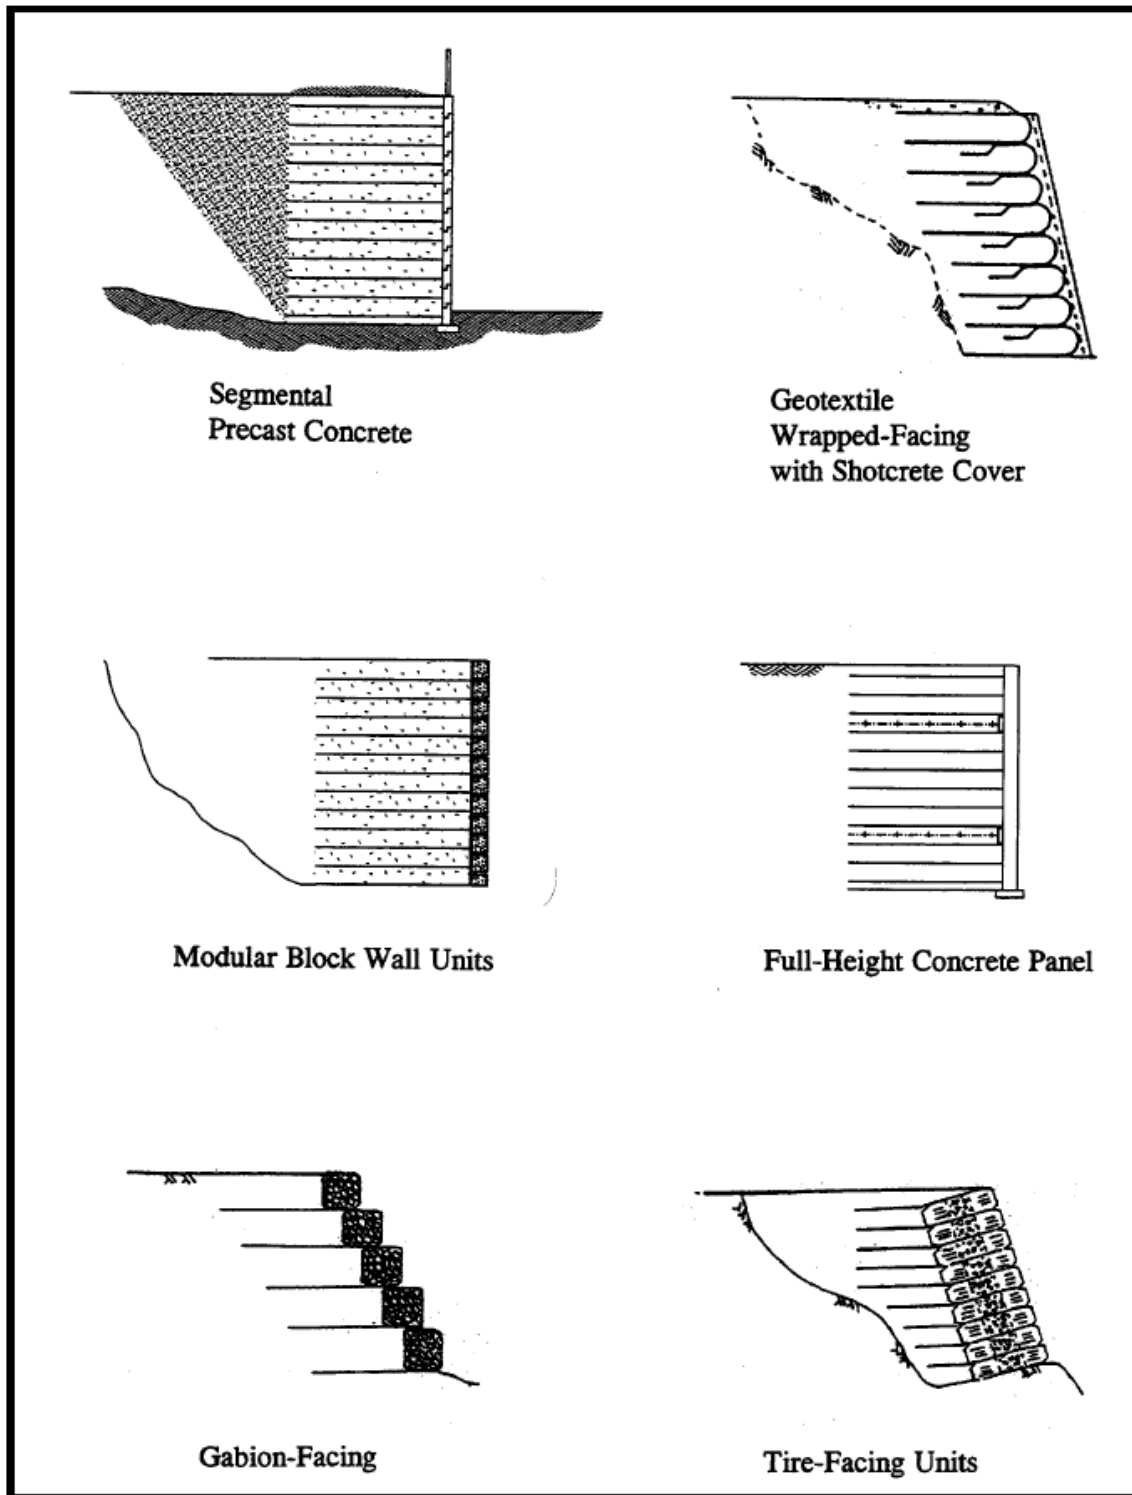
VARIOUS TYPES OF MSE WALL FACING
